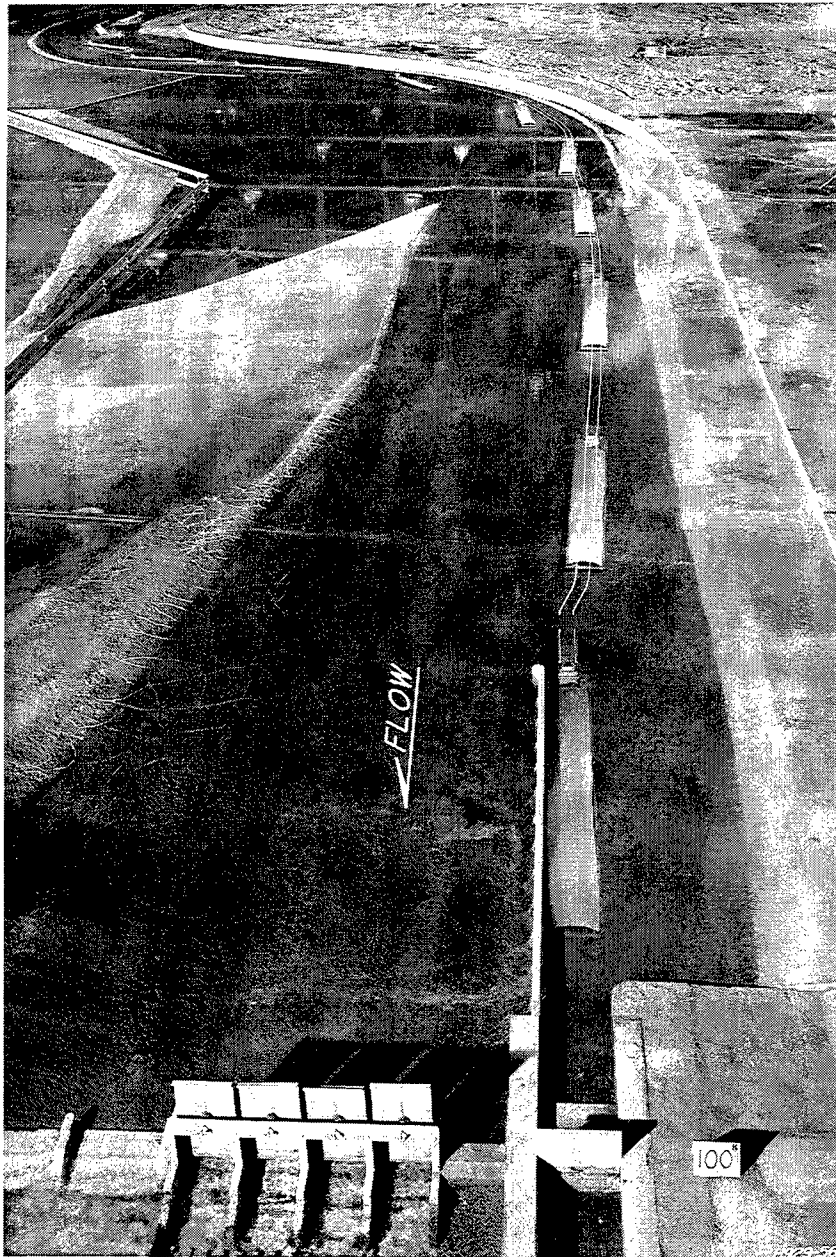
Plan B, looking upstream, discharge 100,000 cfs. Path of down-bound tow entering the upper lock approach
